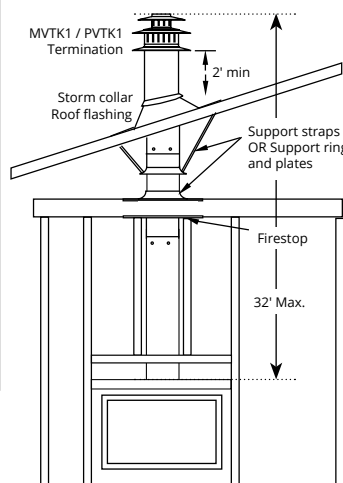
Top vent, roof mounted termination with no offset in vent run.
